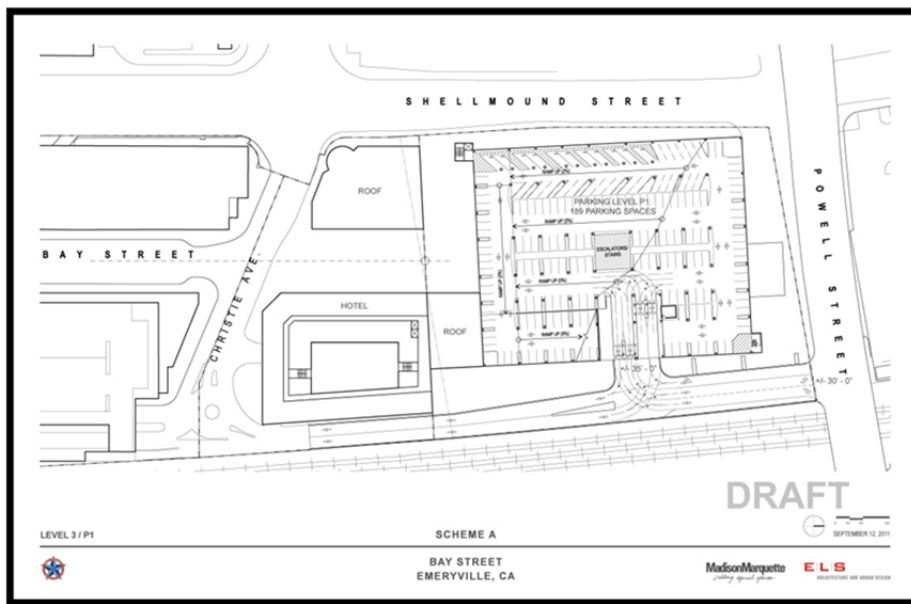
Madison Bay Street - Macy's Plan First Floor Parking Podium Above Macys
